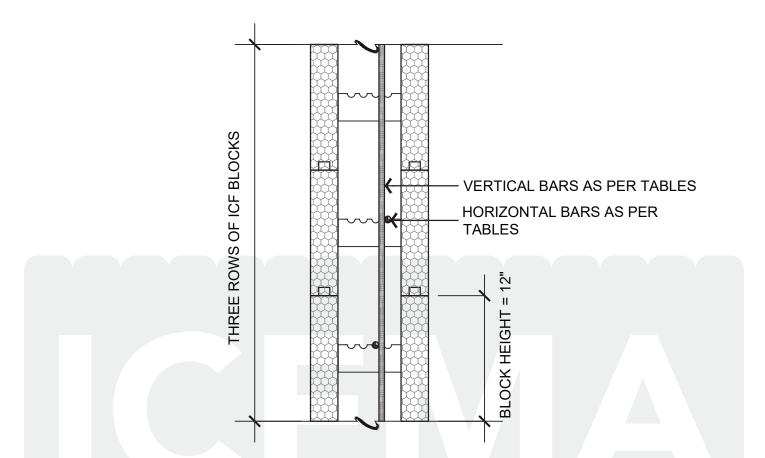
Below Grade Wall Reinforcing Placement for All Wall Thicknesses.
